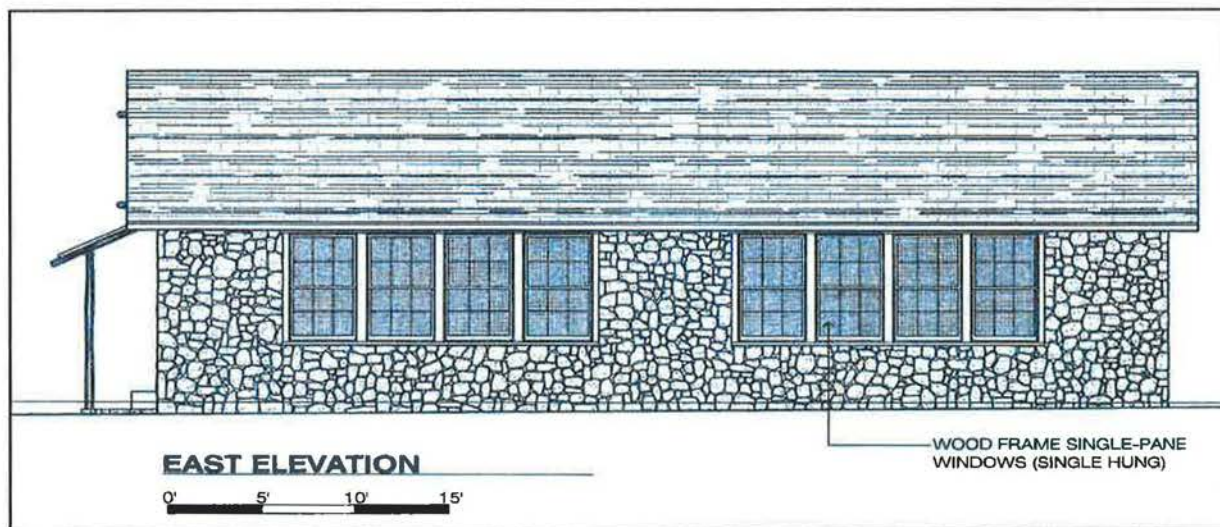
East-southeast elevation of Rock Schoolhouse at Beaver Creek School. From *Documentation of Existing Building: Rock Schoolhouse, Beaver Creek Elementary School*, KDAstudio, 2014.
